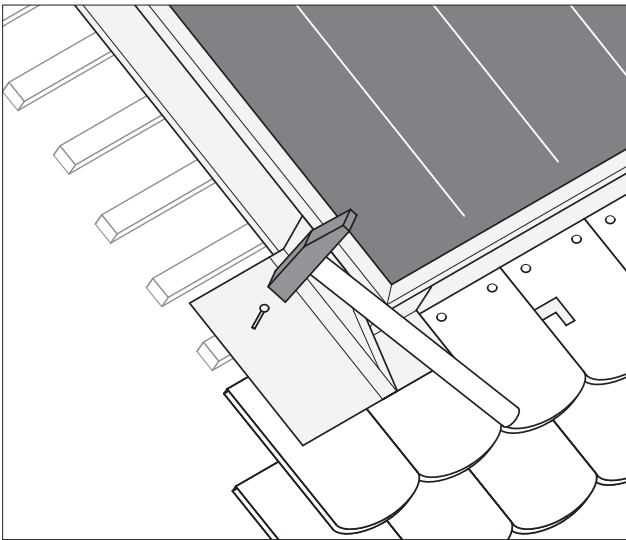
Fix each side panel with roofing felt nails on roof battens.
